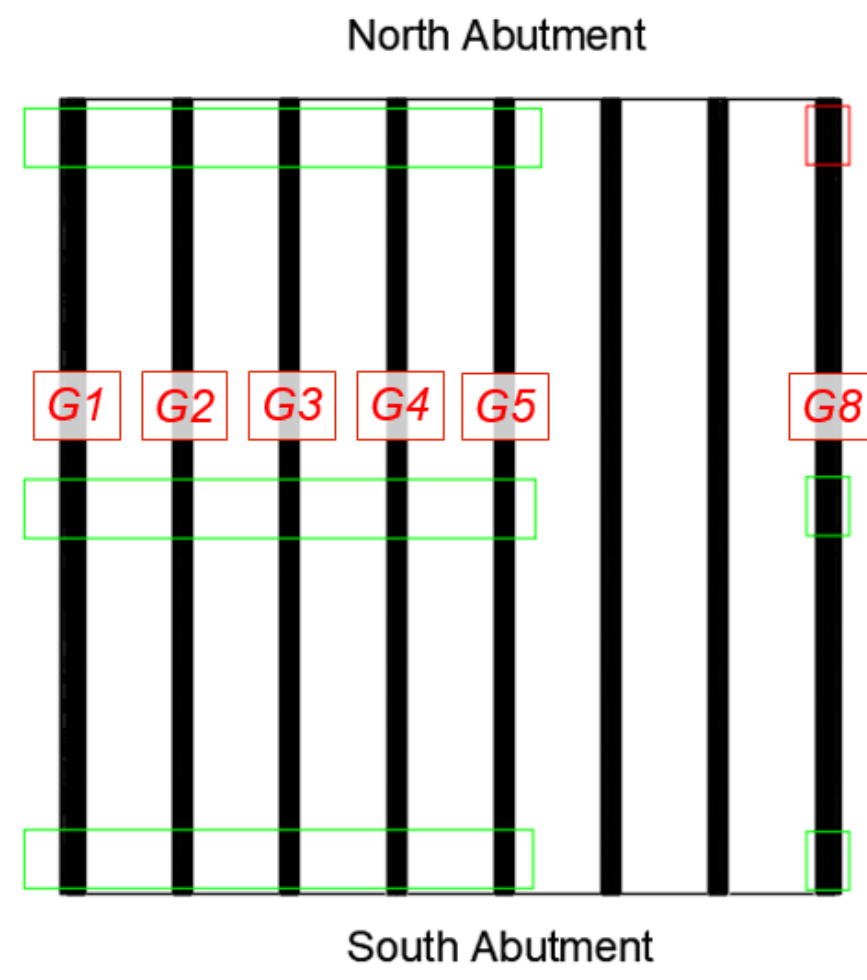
Plan View of Sensor Layout for Yutan Bridge Load Test 1
